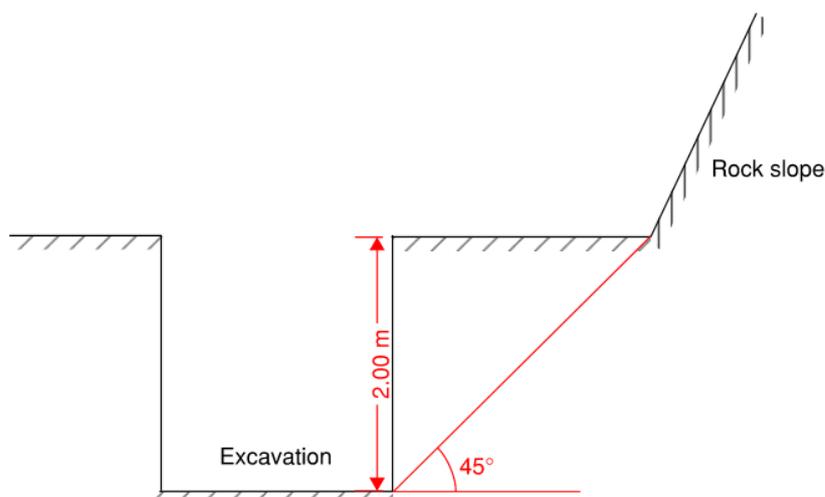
Sketch showing the minimum buffer (45° from the toe of the excavation) required from the toe of excavations up to 2m deep. Note that the sketch does not account for any shoring, benching or battering of the required for stability during construction.
